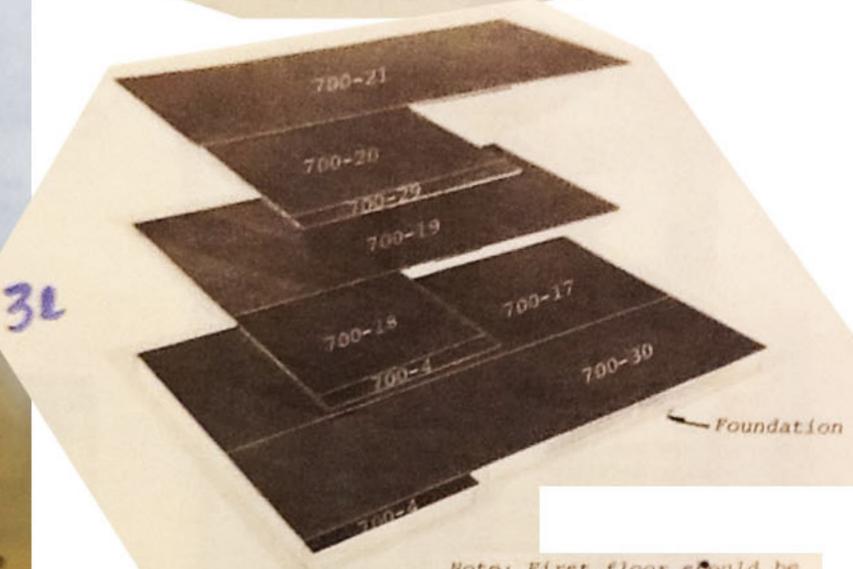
Floor Details Note: First floor should be even with the foundation at the back and evenly overhans on the right and left edges.
